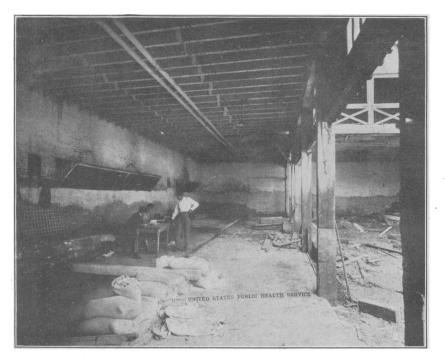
GROUND AREA OF STABLE, SHOWING CONCRETE FLOOR AND CEMENTING OF BRICK WALLS.
